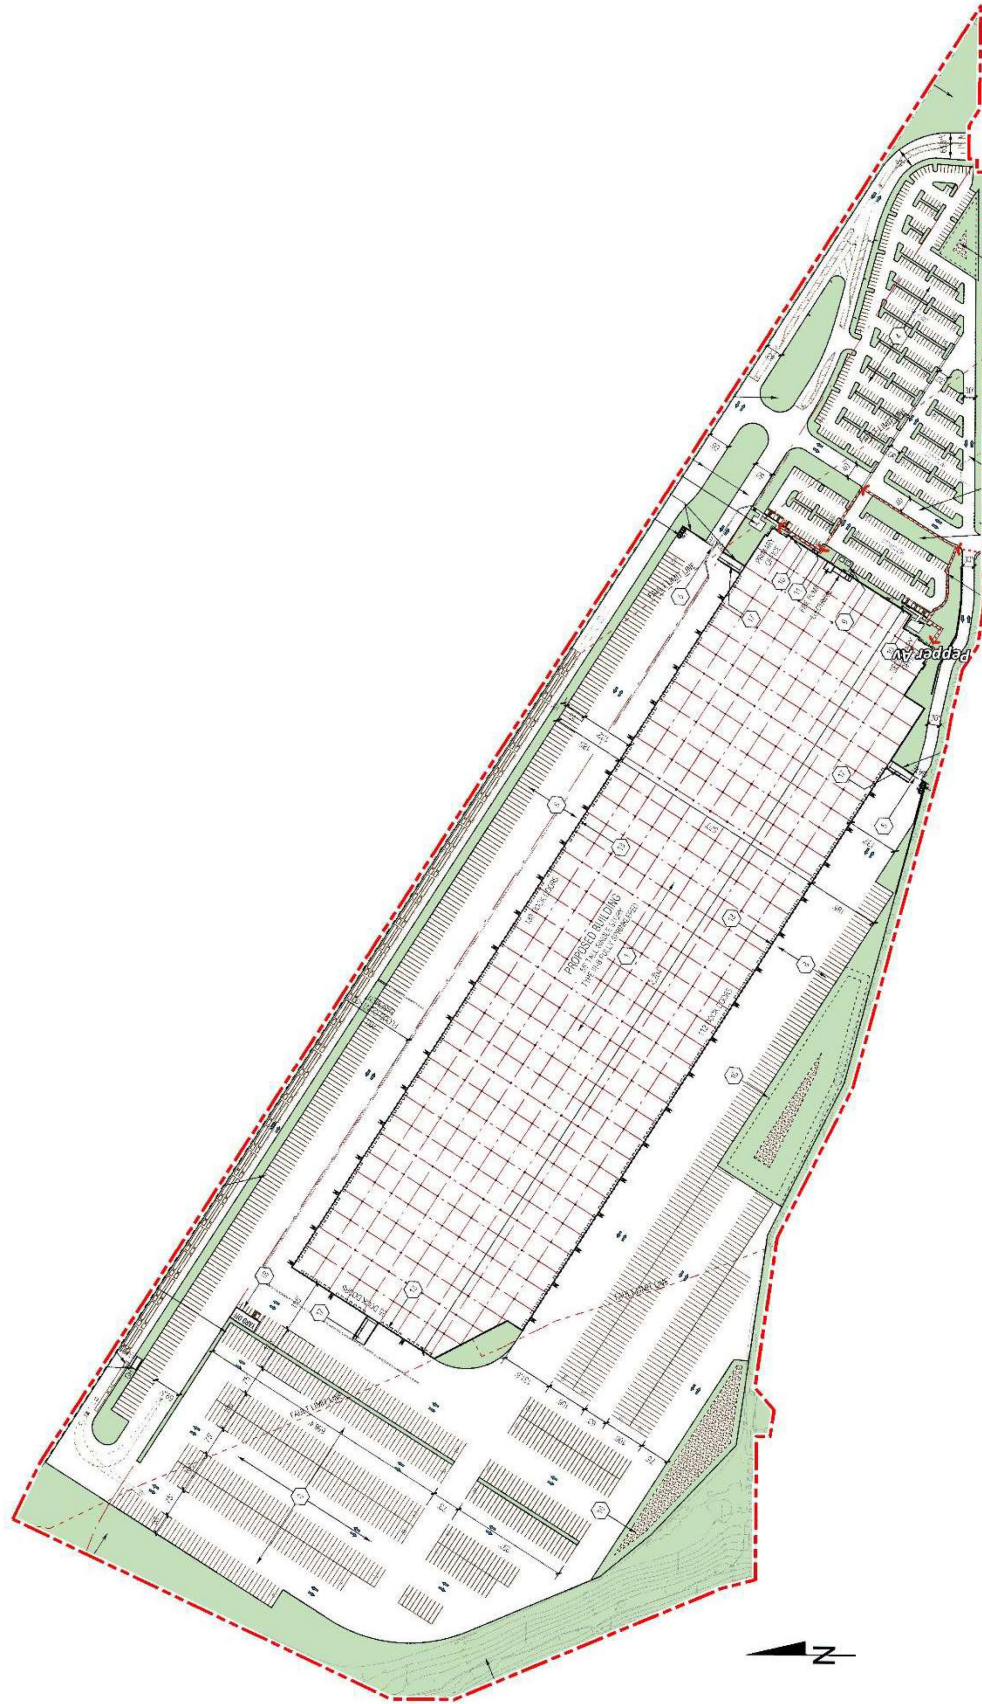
B: PRELIMINARY SITE PLAN
